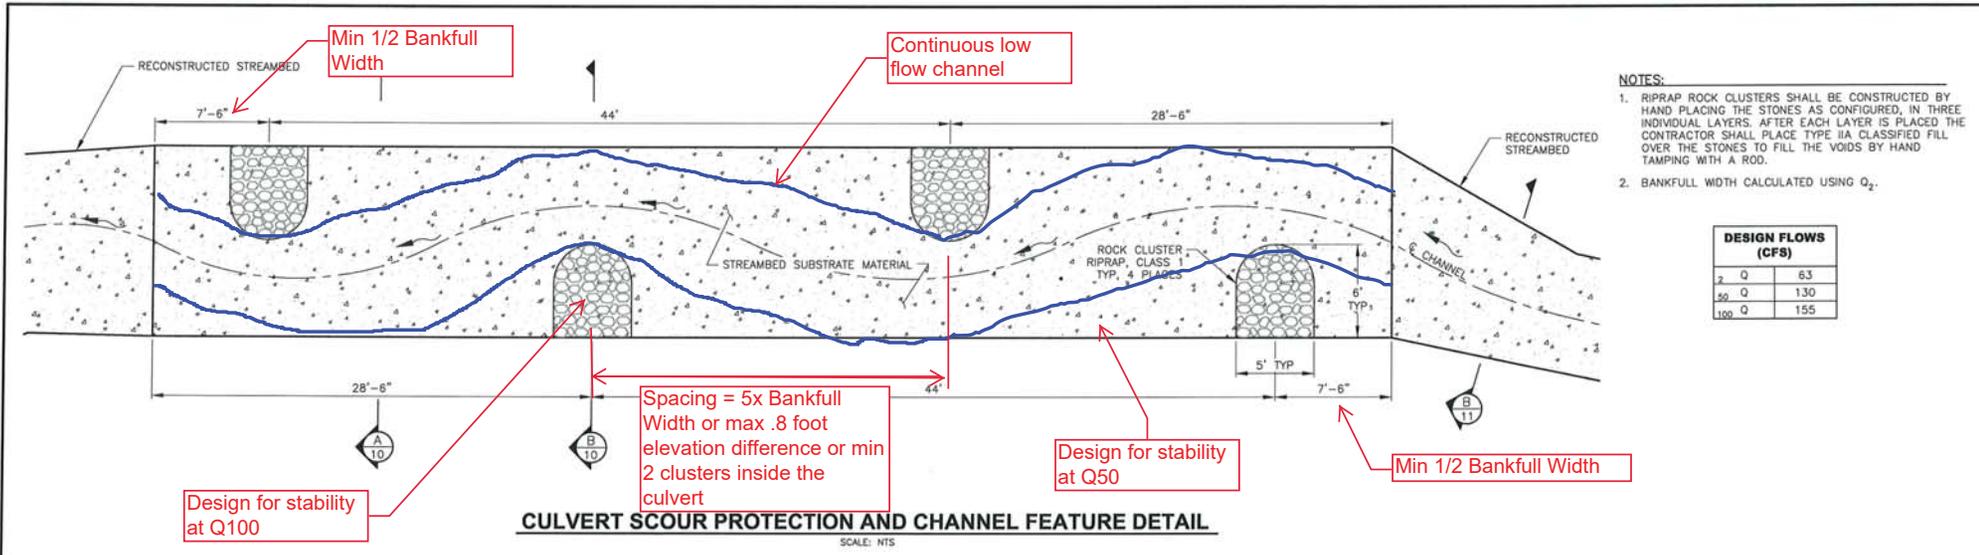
ROCK CLUSTER EXAMPLE - BANKFULL WIDTH CULVERT
